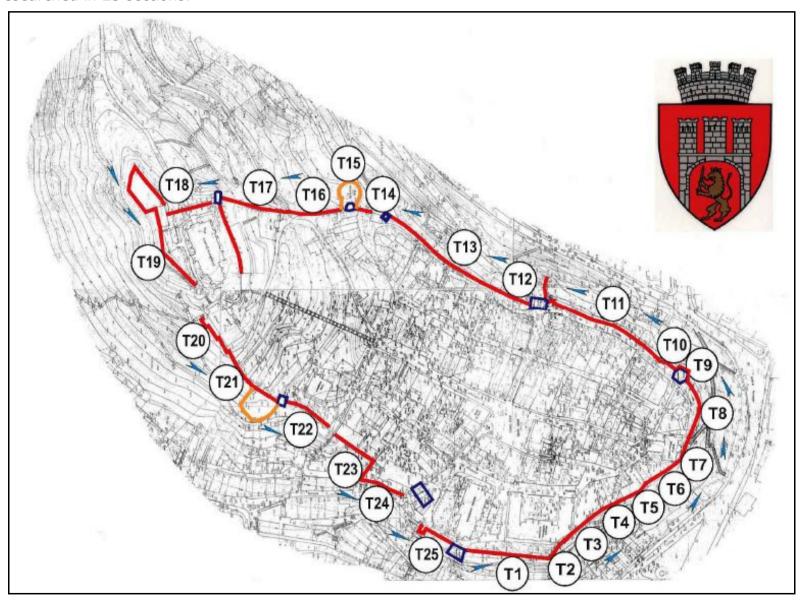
The fortress wall - Planimetric scheme of the research sections, 2004-2007
